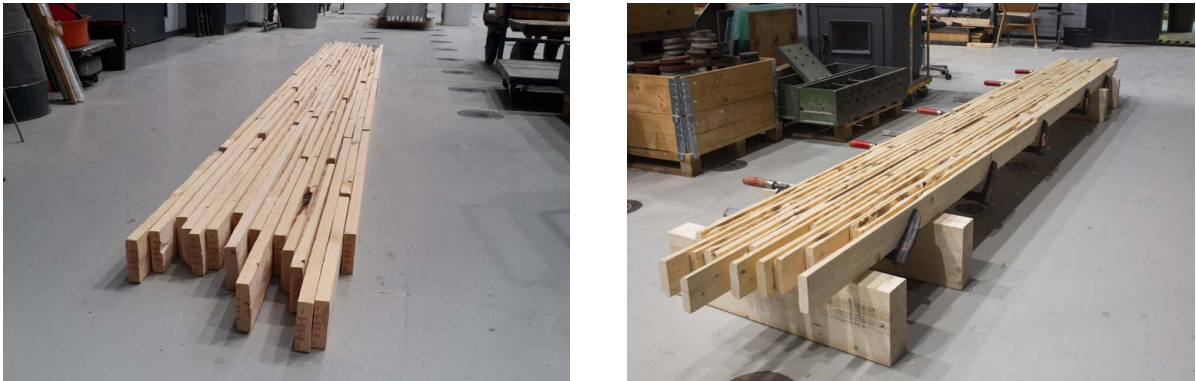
Bridge deck: (left) possible arrangement of the timber boards to form a the bridge deck; (right) possible application (here the timber boards are not connected with wood nails).
